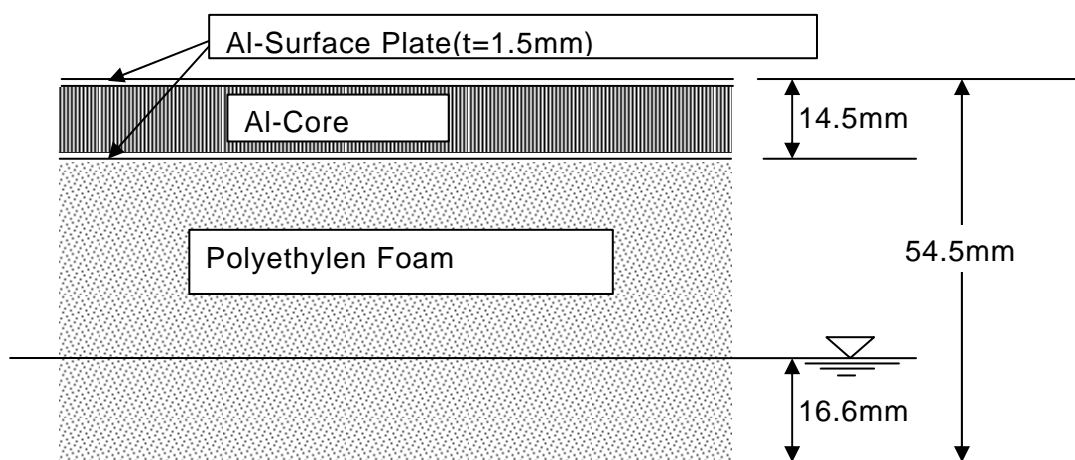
Cross Section of the Al-Honeycomb Panel Model
